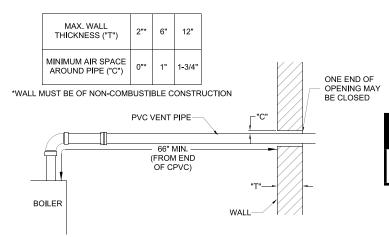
Wall Penetration Clearances for PVC Vent Pipe
